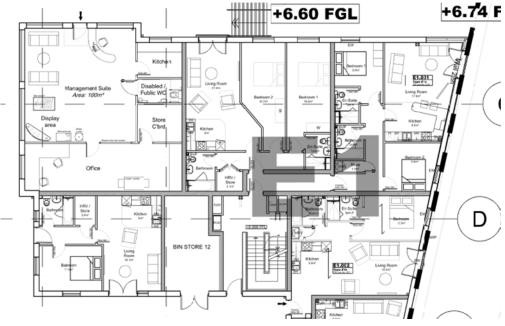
Revise layout to bock E1 featuring proposed manaement suite and new apartments relocated from G2/G3
